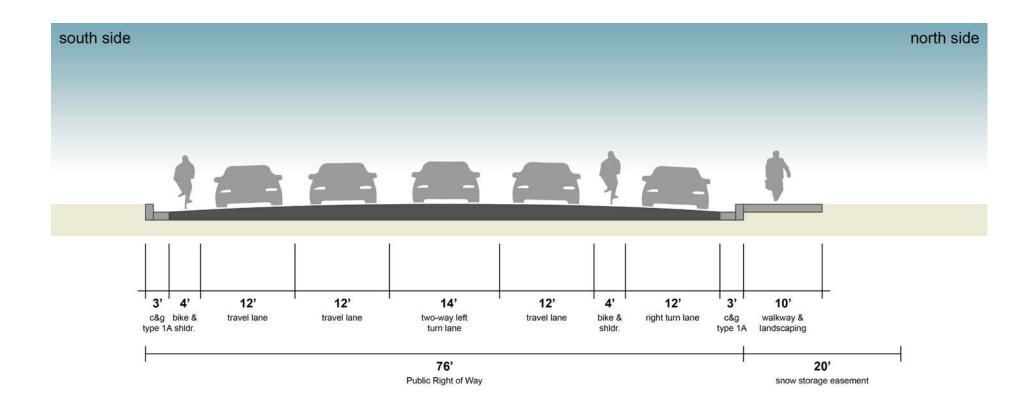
SECTION M: SQUAW VALLEY ROAD (EAST)
